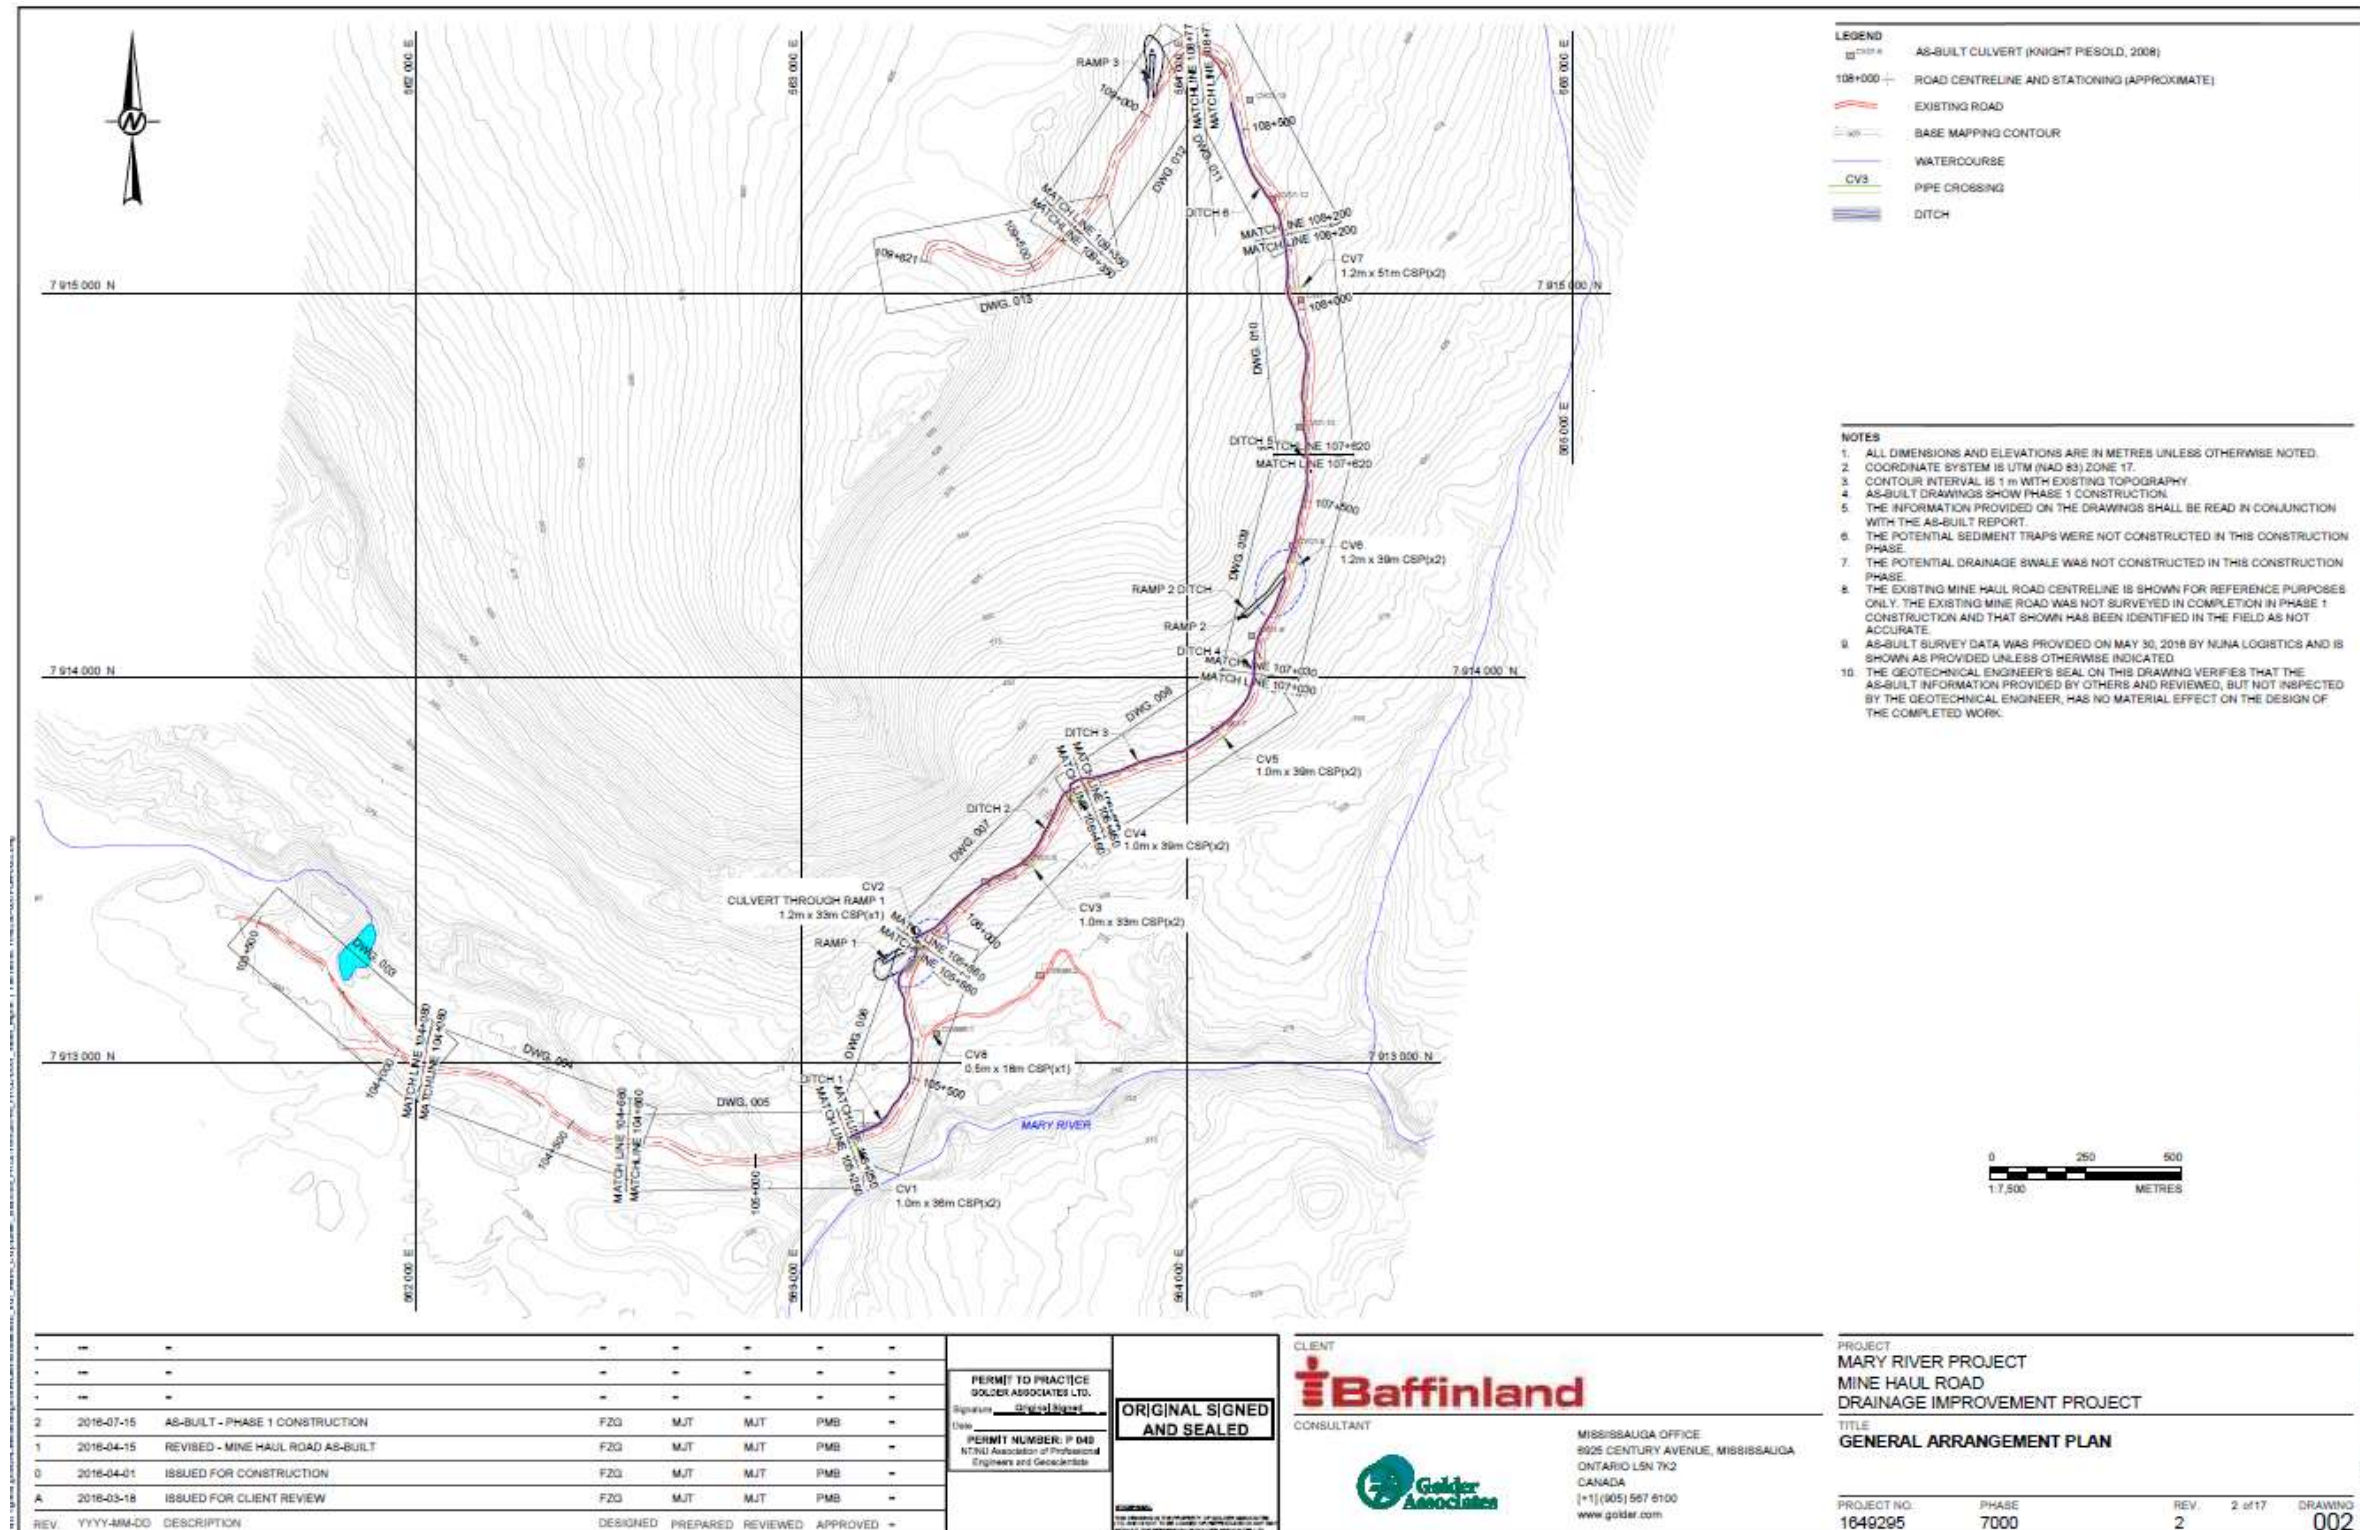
2016 MHR Drainage Improvement As-Built Plan View
